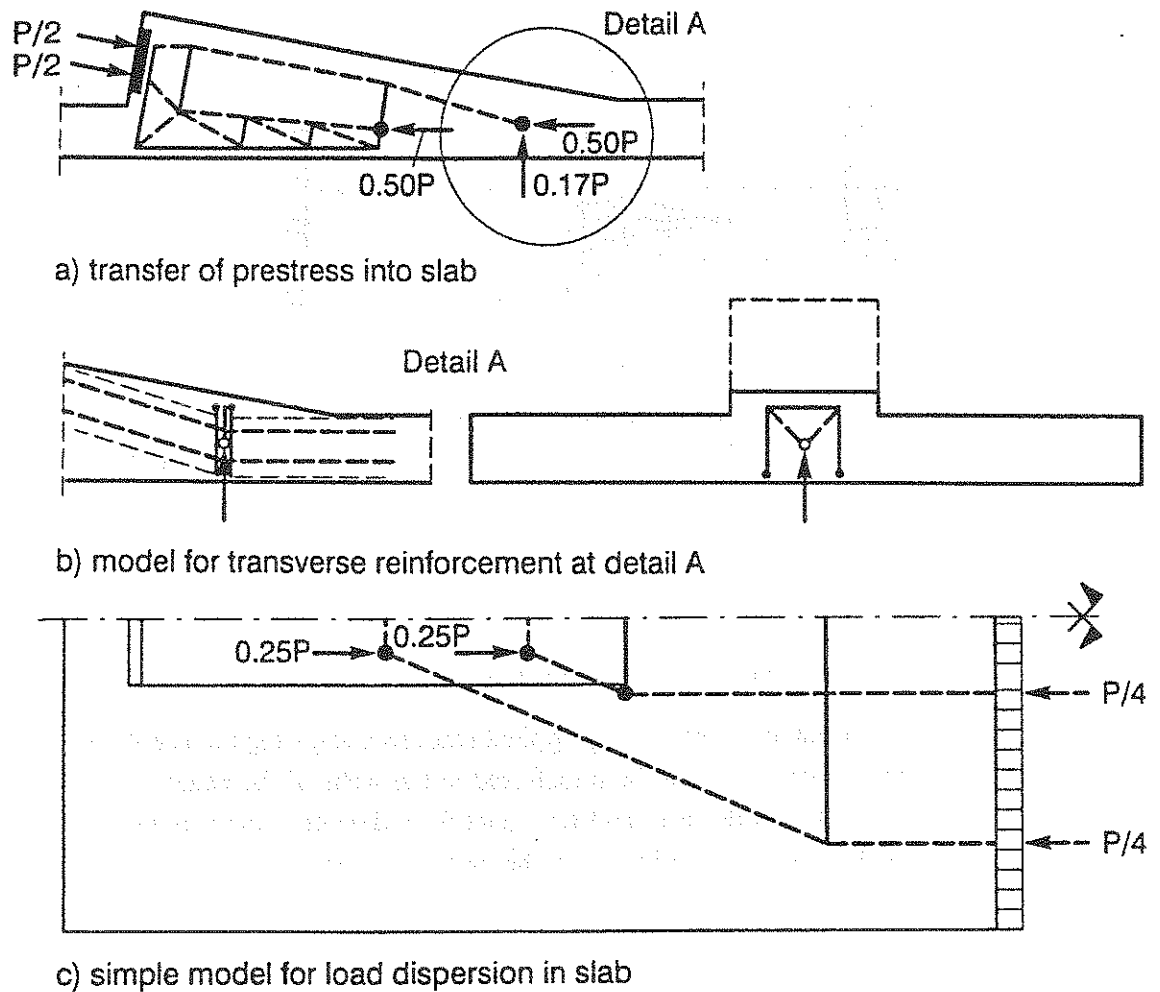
Strut-and-tie model and reinforcement for a blister
